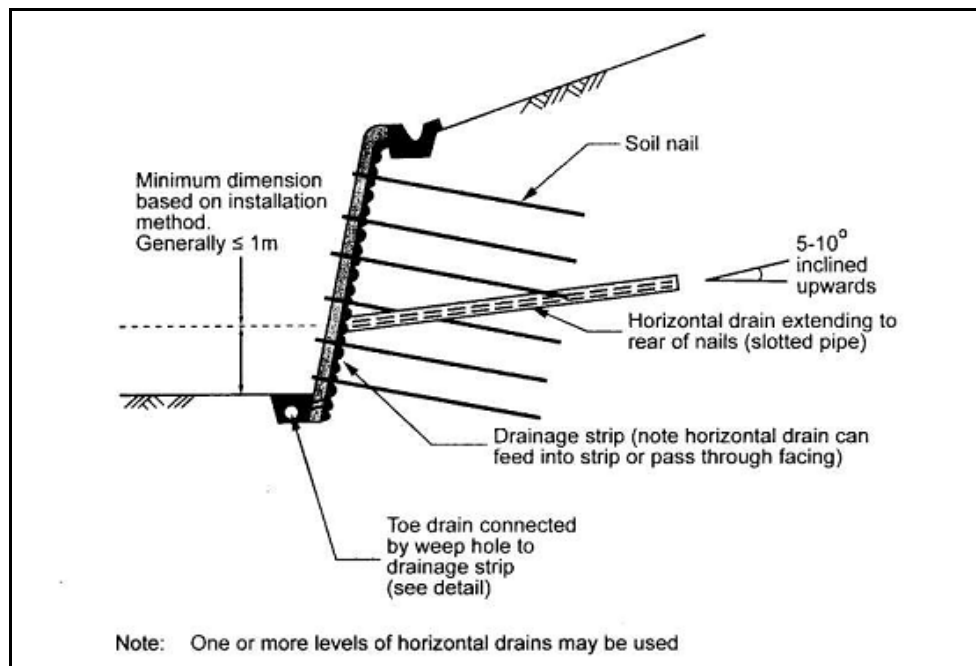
Example of a horizontal drain and a weep hole in a steep soil-nailed slope (Phear *et al.*, 2005)
